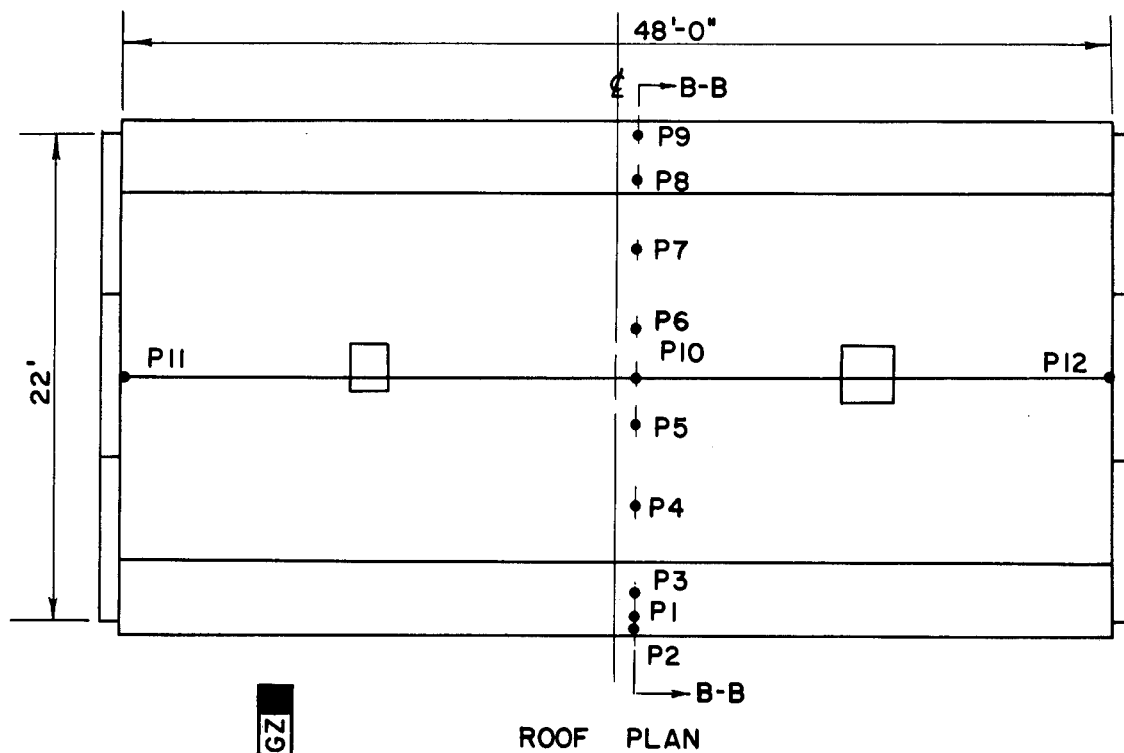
Gage Layout for Project 3.13b Uncovered Gable Structure
